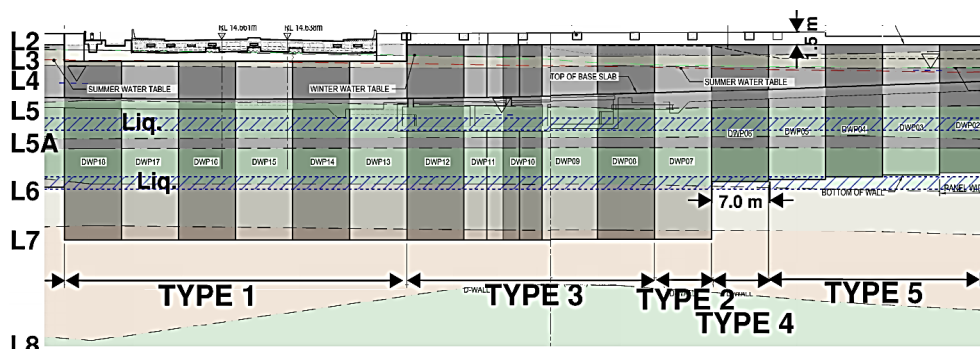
D-Wall Long Section (partial) and Ground Profile (screw pile not shown for clarity)
